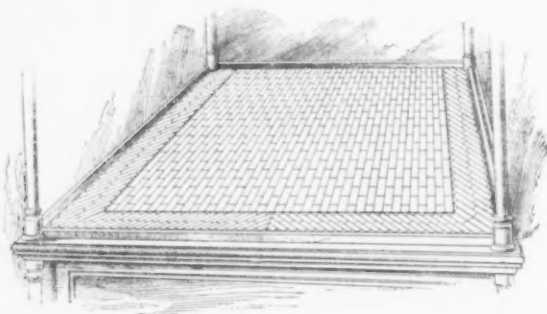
Floor of Show Window, Made of a Single Color of Light Tinted Tile.
